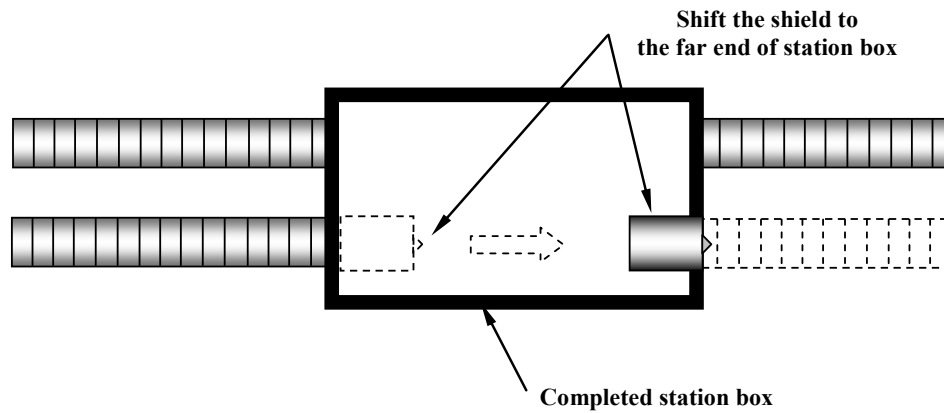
Construction Method of the South Section (Suwansawat, 2002)
